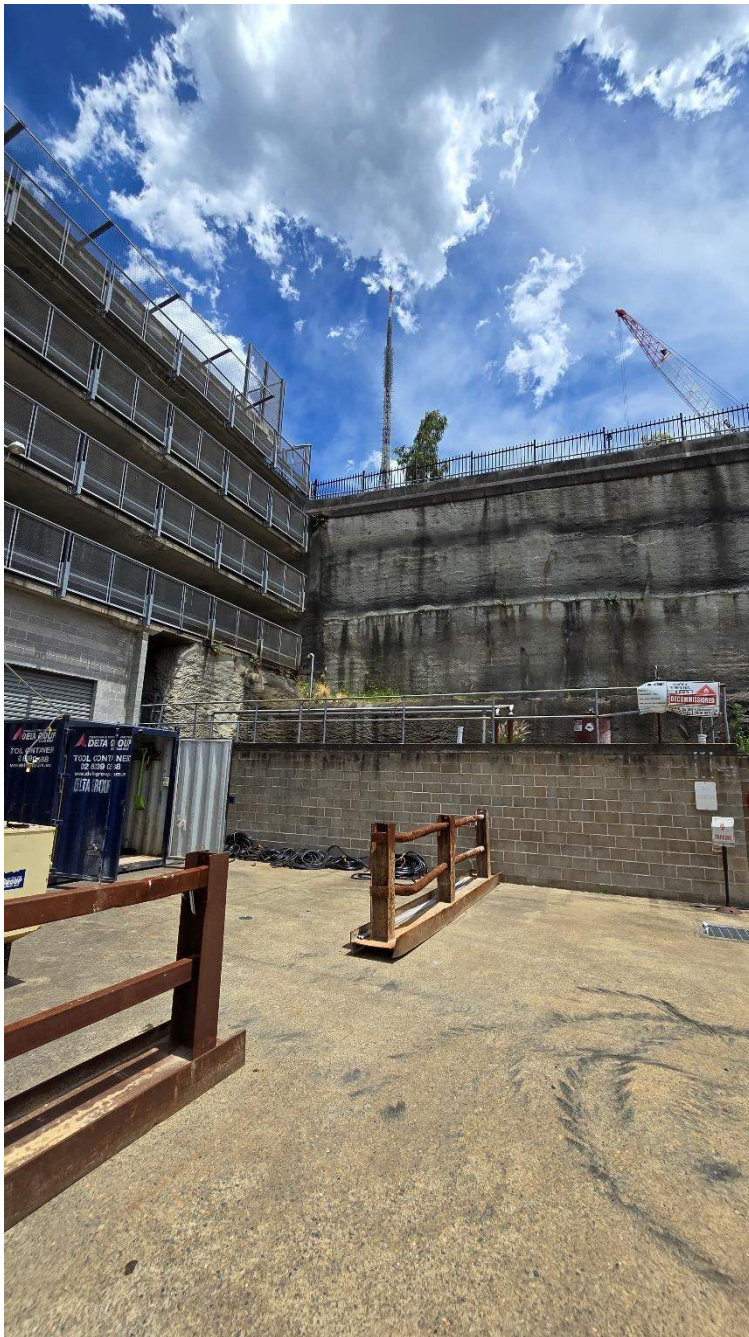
Cracks observed (46, 47, 48, 49) - Retaining wall exhibited signs of horizontal surface cracking
